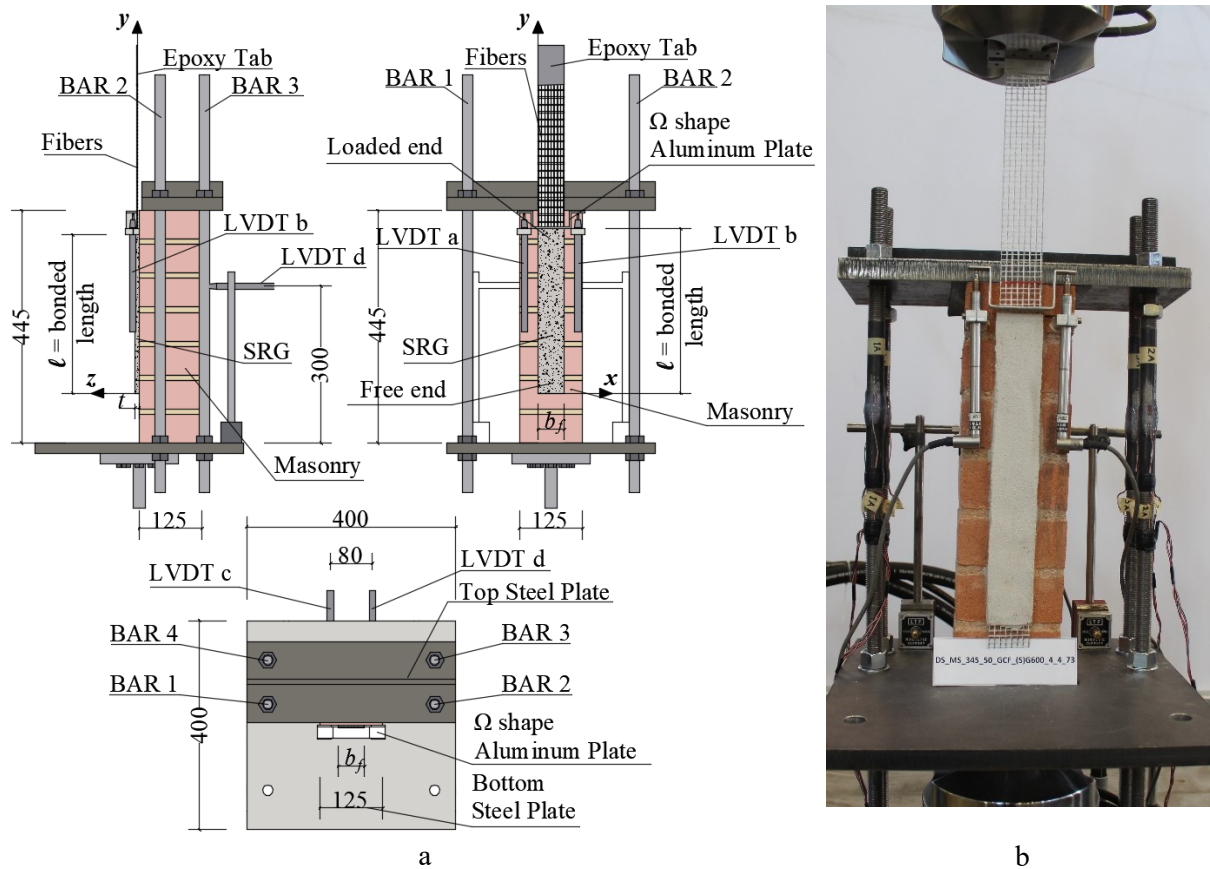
Single-lap shear test setup: sketch (a) and photo of a representative specimen (b).
